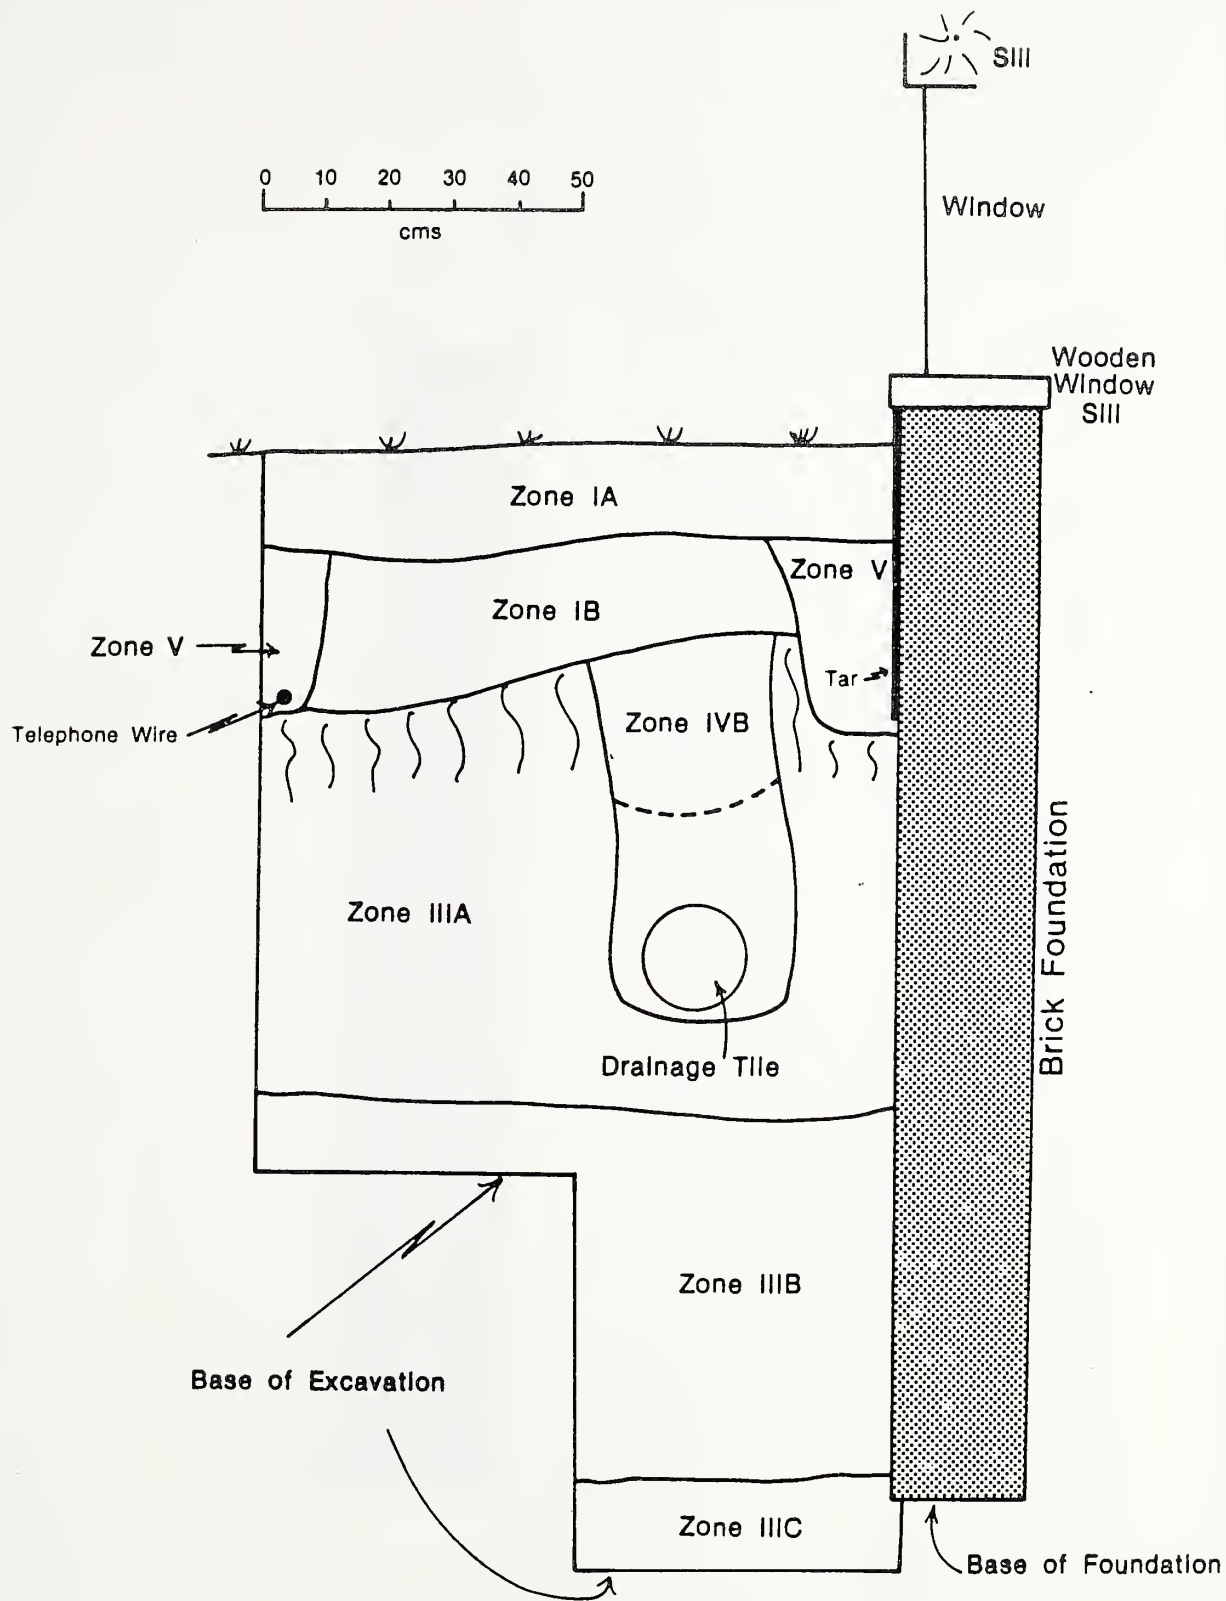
Lincoln Site, Test 2, East Wall Profile.
